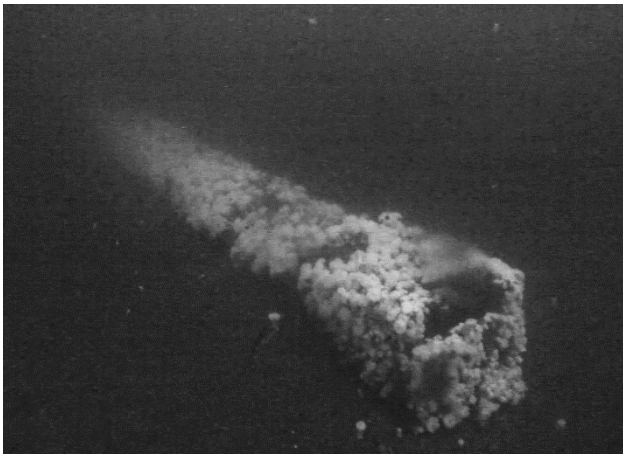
A flush manhole cover on the 120-inch outfall. This type of manhole cover is also on the 90- and 72-inch outfalls.
